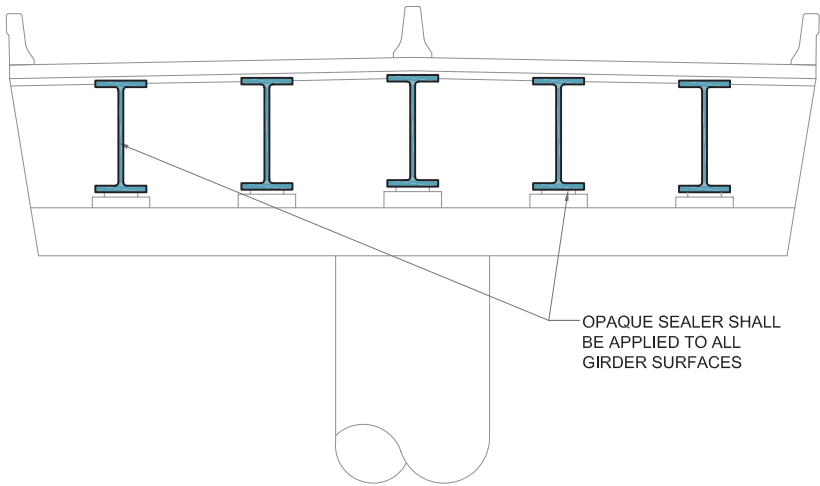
Required surfaces for aesthetic treatment on steel girders
